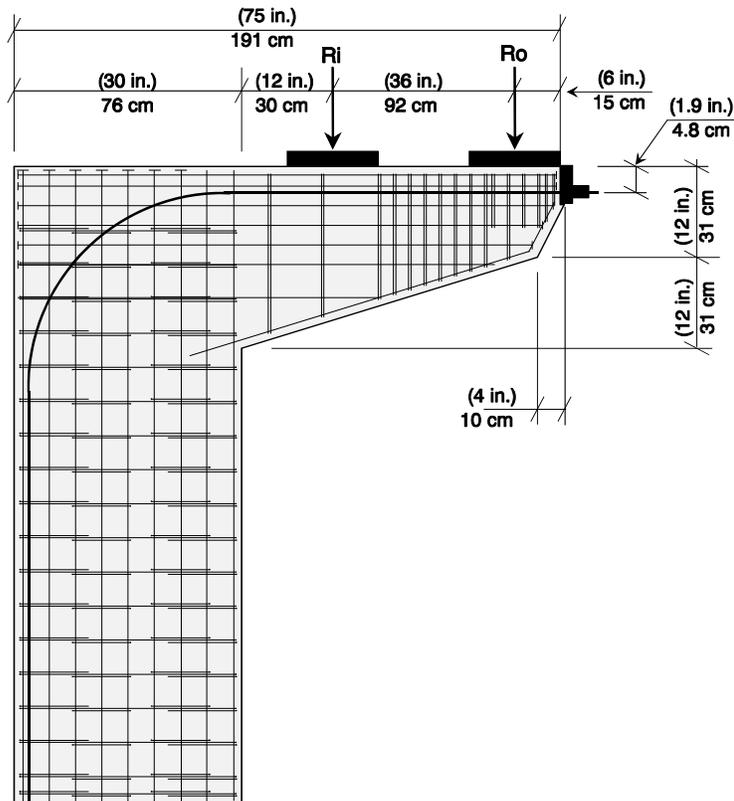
Reinforcement details for Specimen POJ-PU-74-TH
